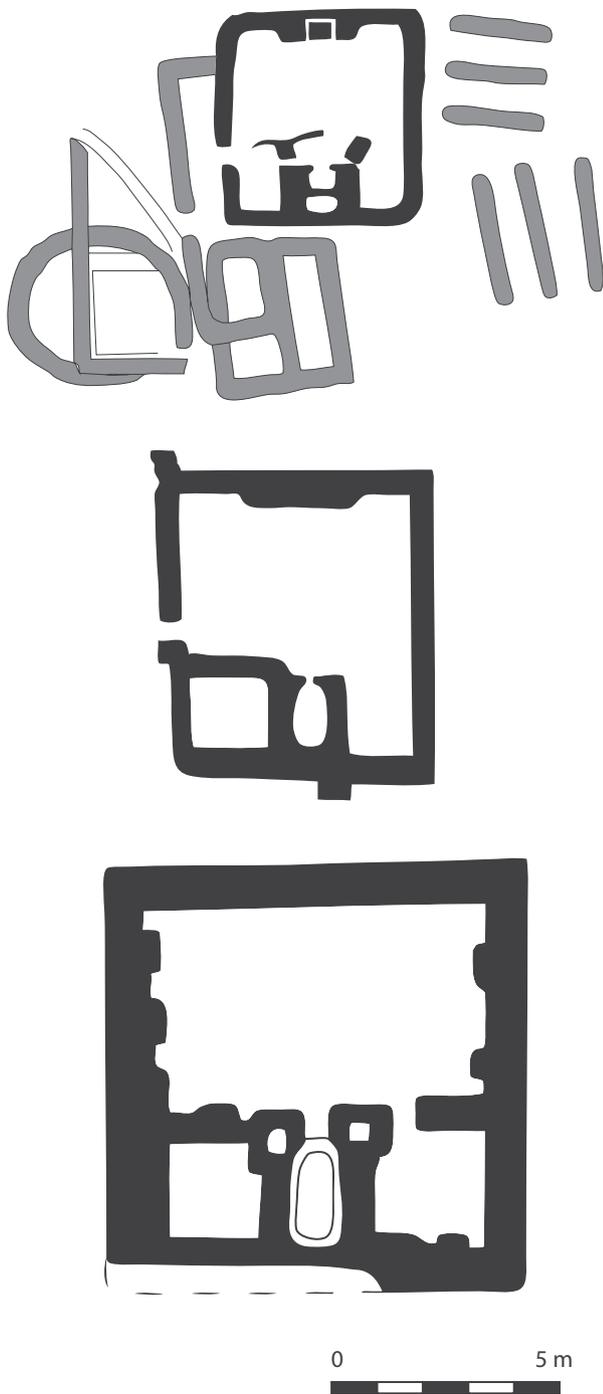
Three examples of Neolithic house plans from Turkmenistan; upper and middle from Jeitun, lower from Pessejik (after Müller-Karpe 1982, Fig. 14).
